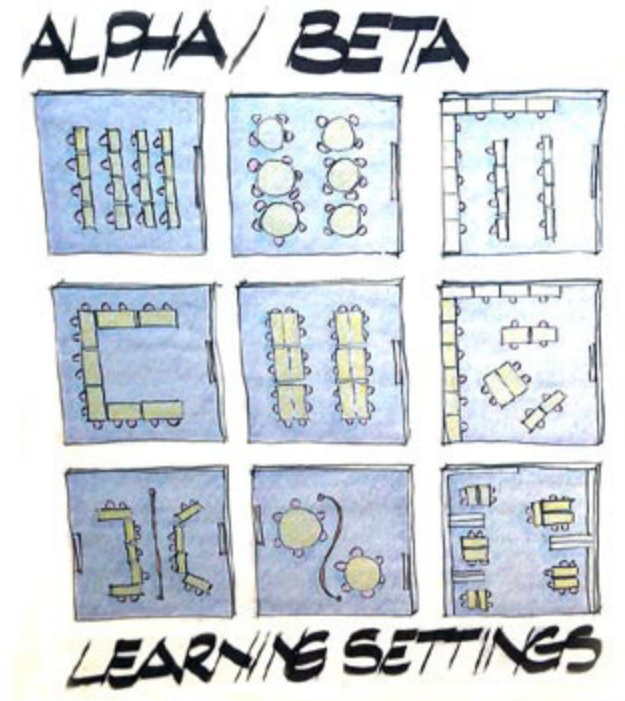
School of One Pilot Design - Proposed Configurations of Classrooms
